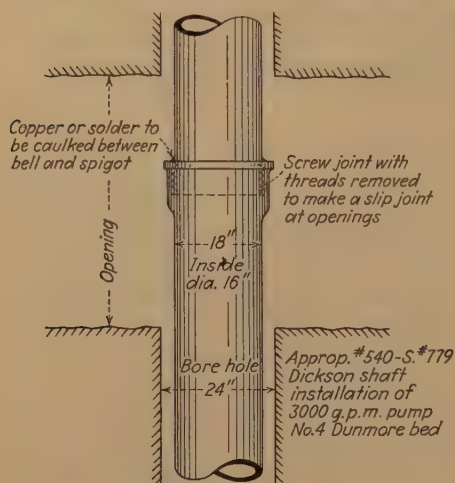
SCREW-JOINT CAST-IRON PIPE.
